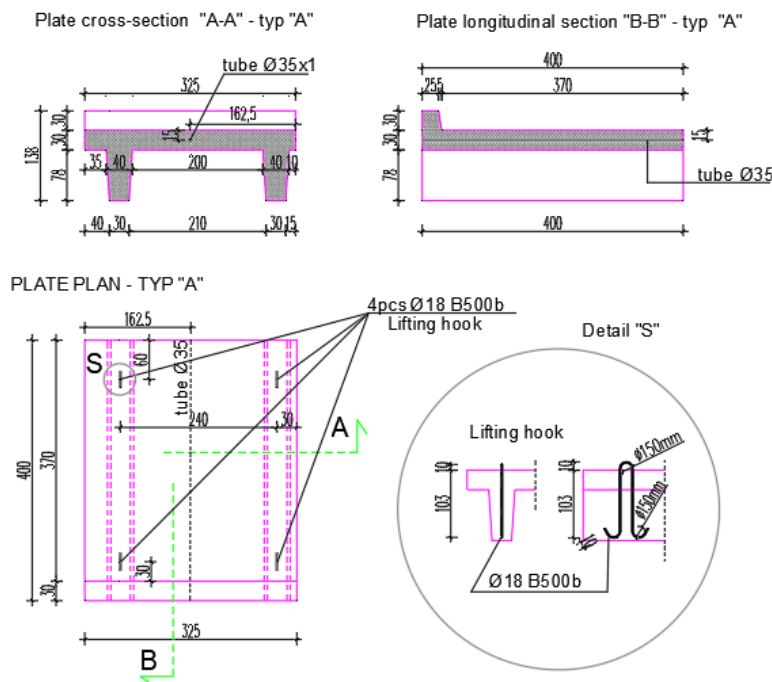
Assembly-disassembly element longitudinal and cross-section – type "A" [2]
